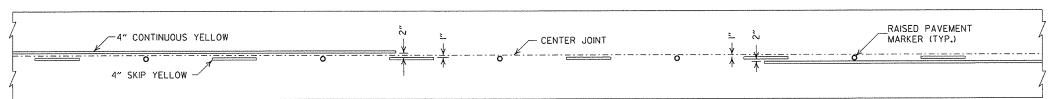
DETAIL OF STANDARD RAISED PAVEMENT MARKERS
